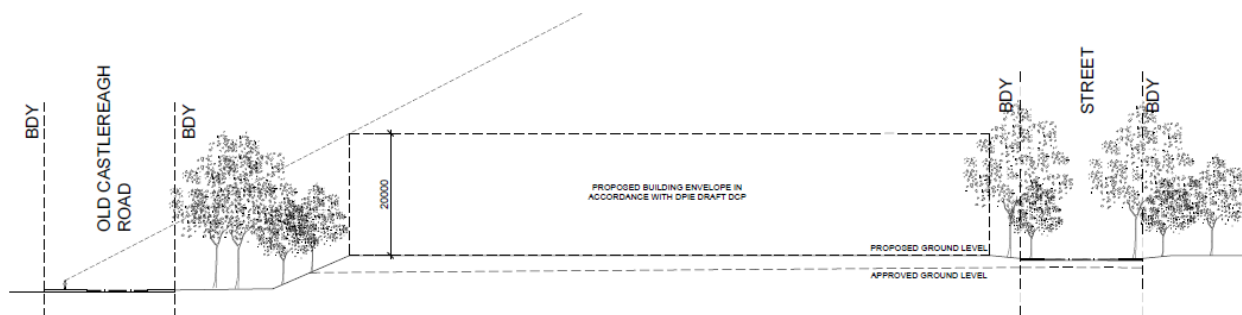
Section (Location 07) showing ground levels at Old Castlereagh Road boundary (Source: MCHP Architects)
